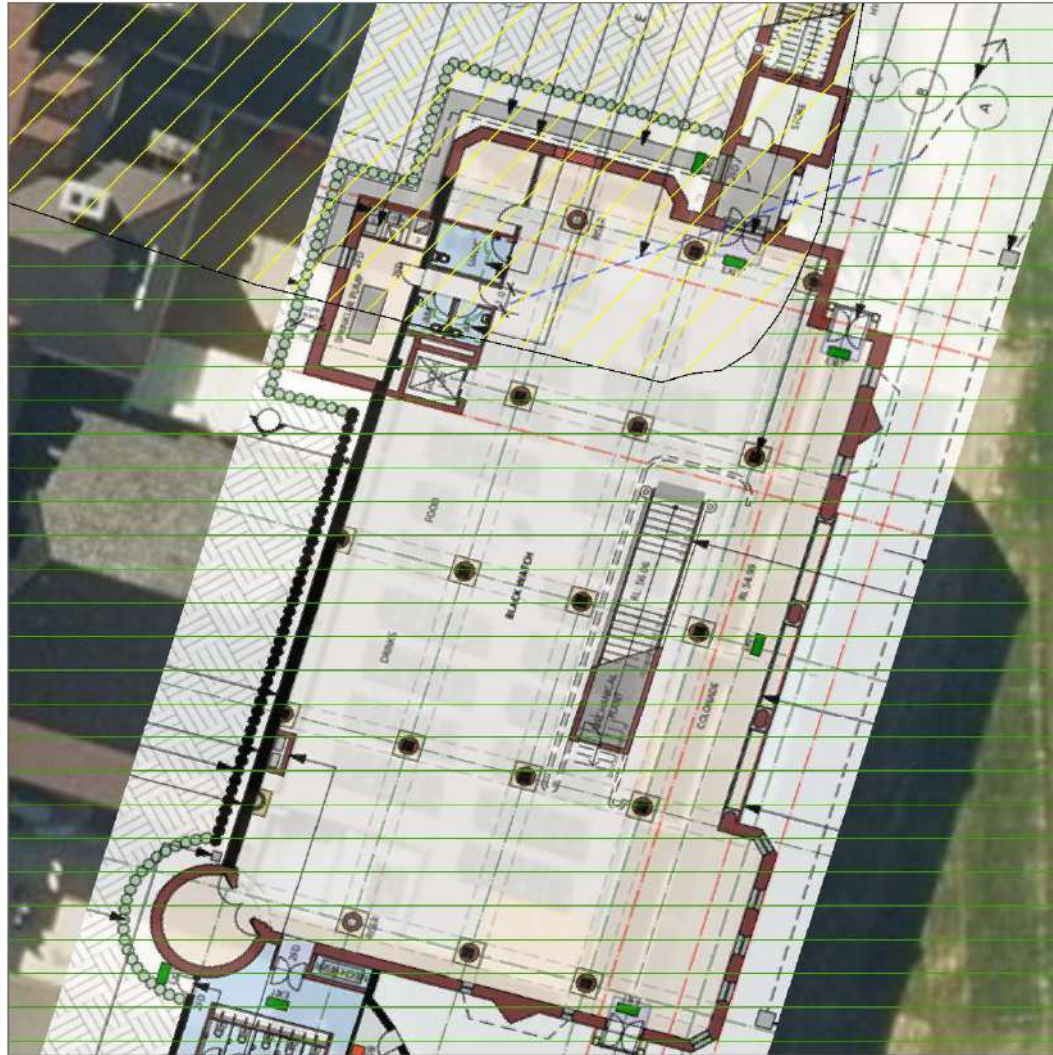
Proposed first floor plan. (Source: JCA Architects, Drawing No. SSD1.02/17-202, Scale 1:200 @ A3)
